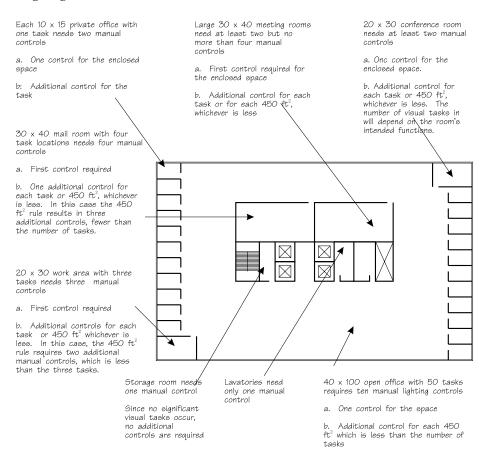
D shows a partial floor plan of a typical office building and shows how the control point methodology is applied.
